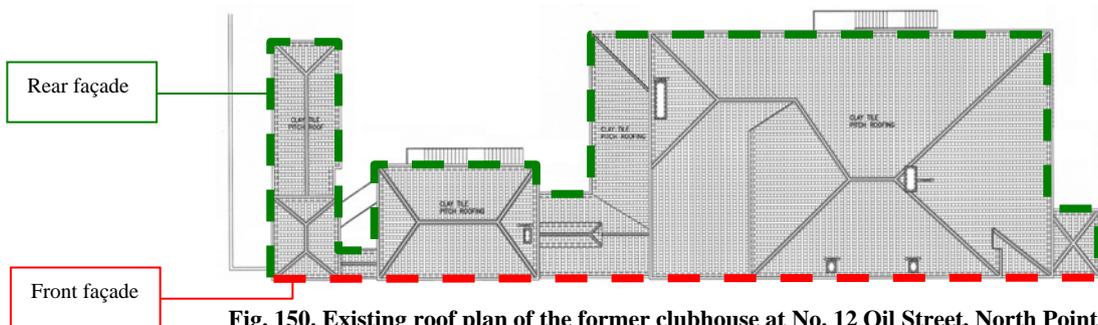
Existing roof plan of the former clubhouse at No. 12 Oil Street, North Point (1:500).
